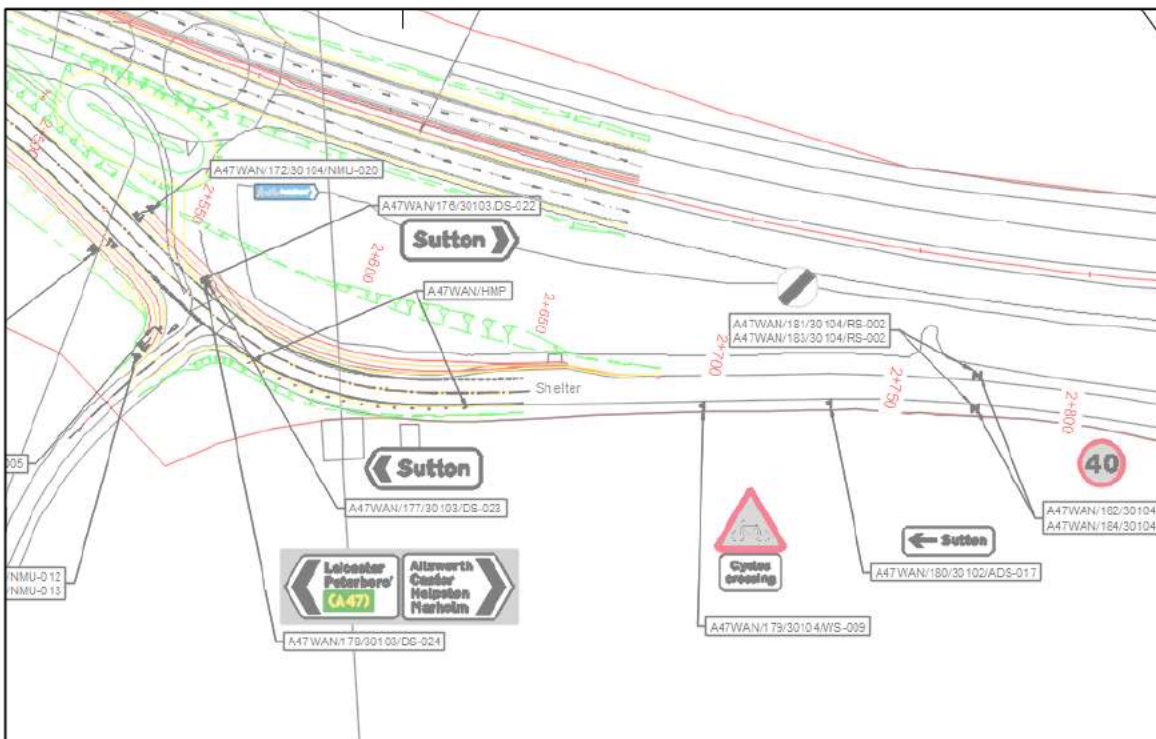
Westbound approach to the proposed Peterborough Road link crossing
